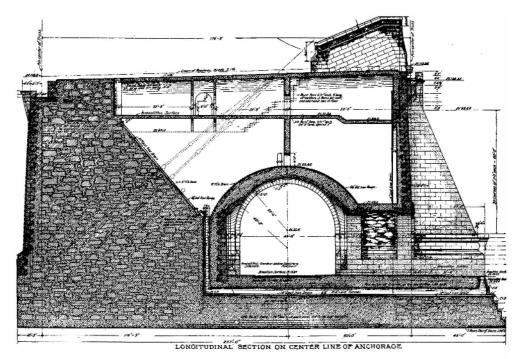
SECTION OF ANCHORAGE, MANHATTAN BRIDGE.
